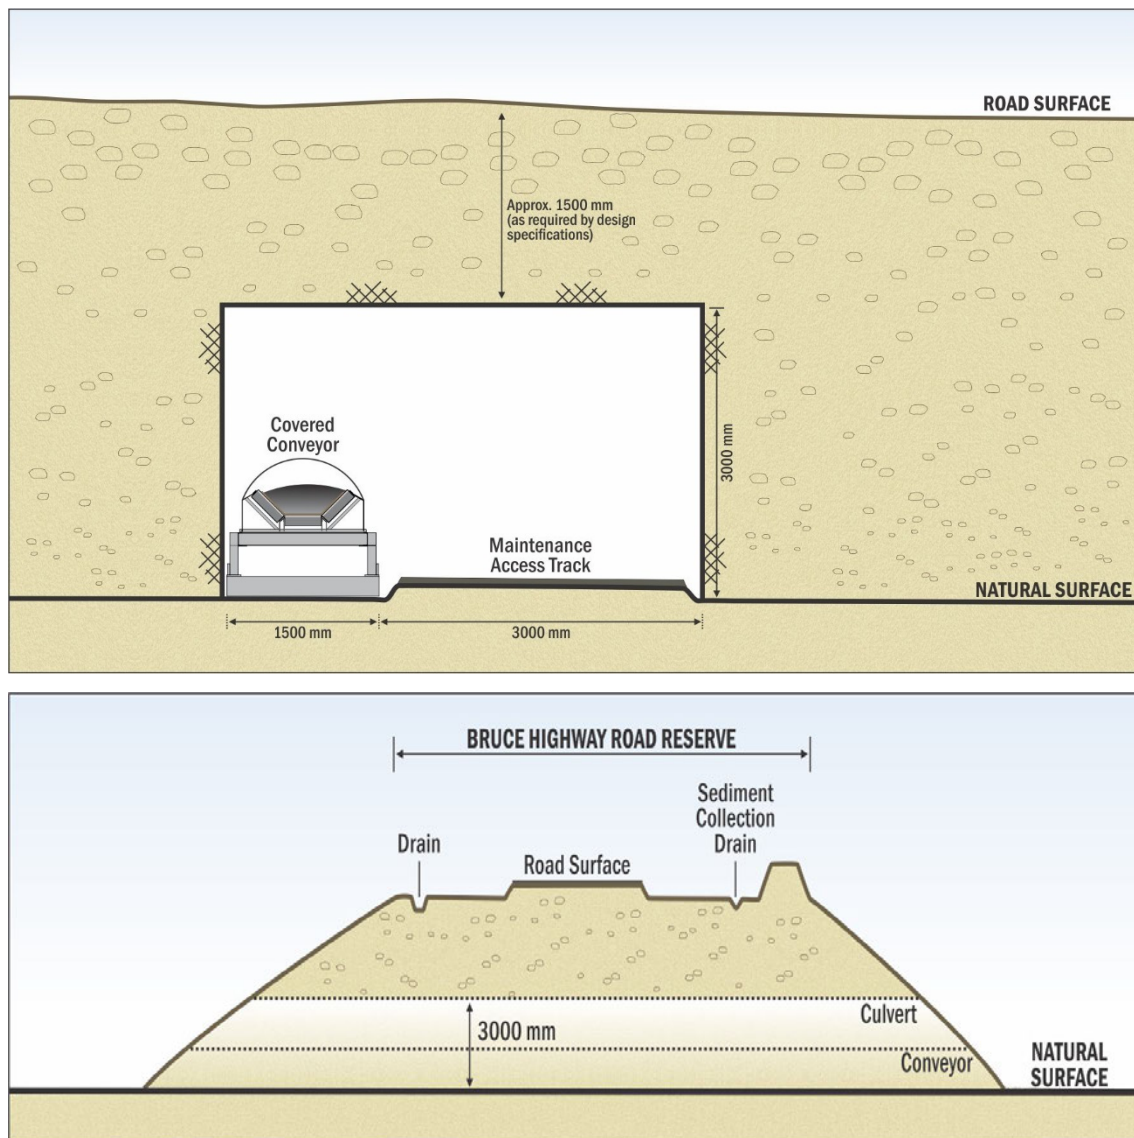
New conveyor arrangement under the Bruce Highway [from 2028 onwards]
